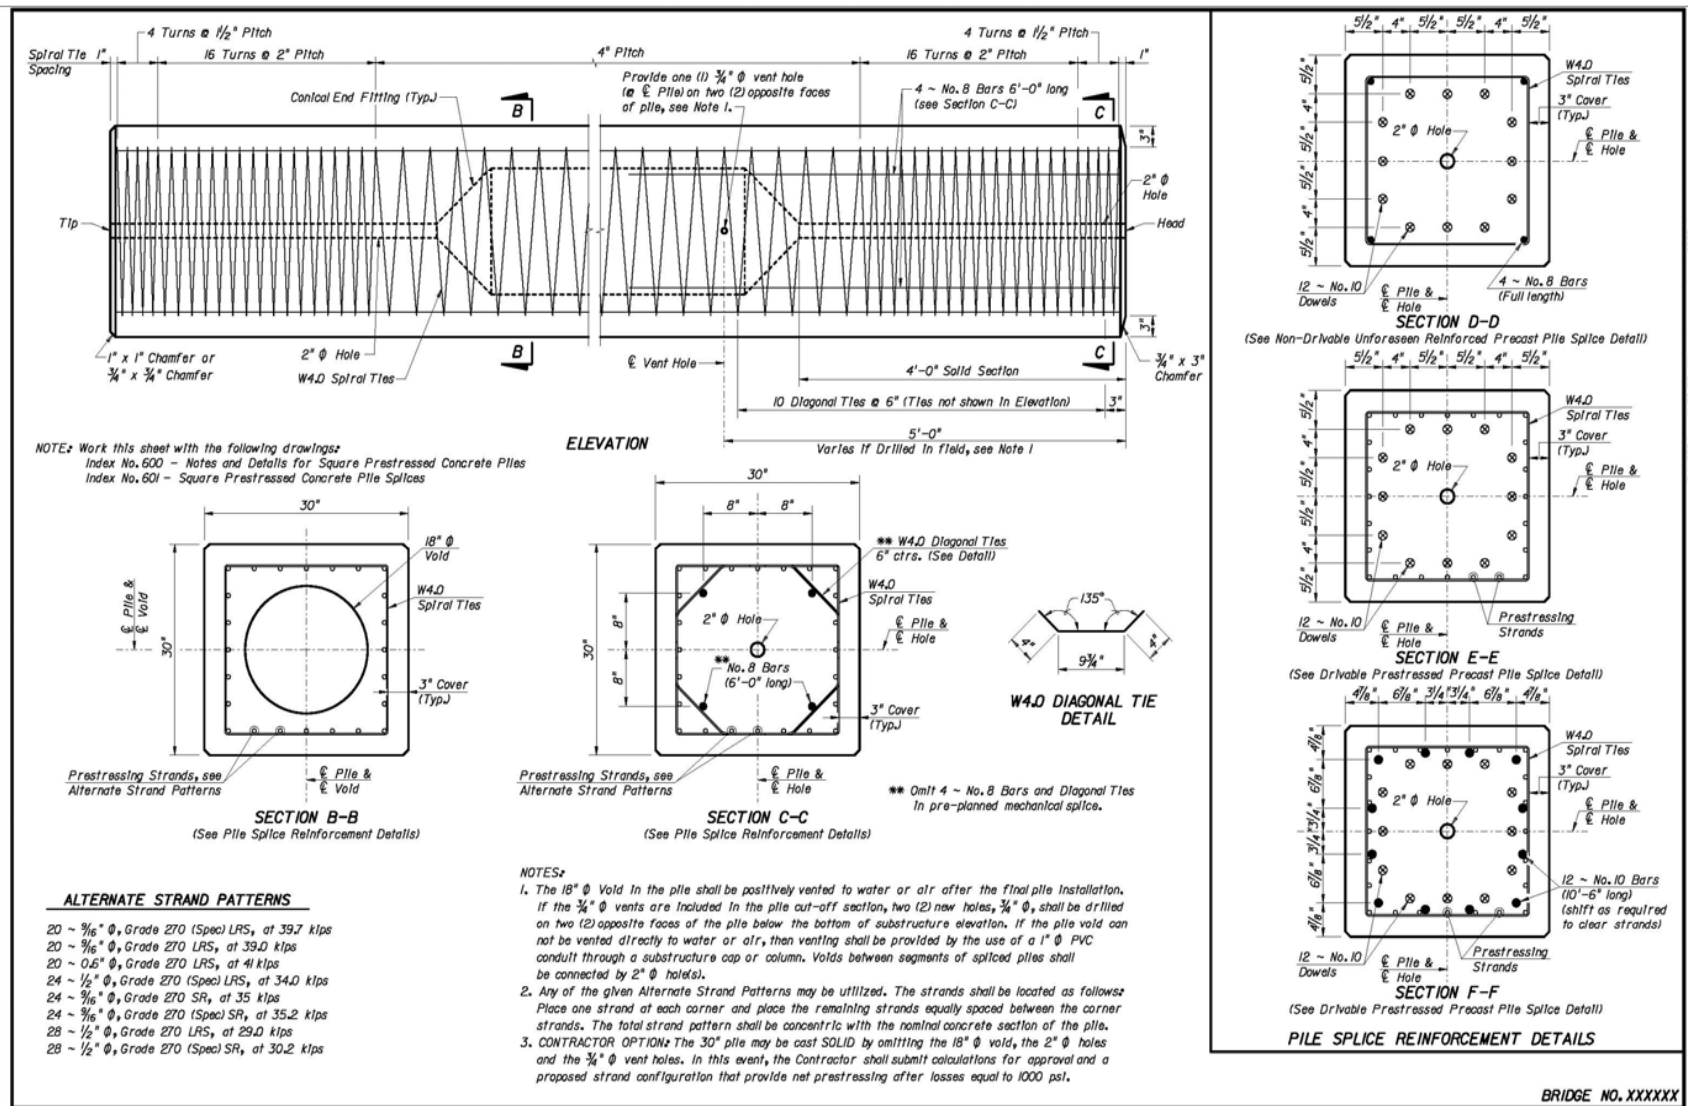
Details of 30 inch Square Prestressed Concrete Piles (Florida-DOTD 2004)
